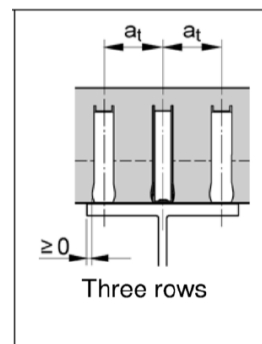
Spacing of connectors for slabs with transverse decking and connectors parallel with the beam.
